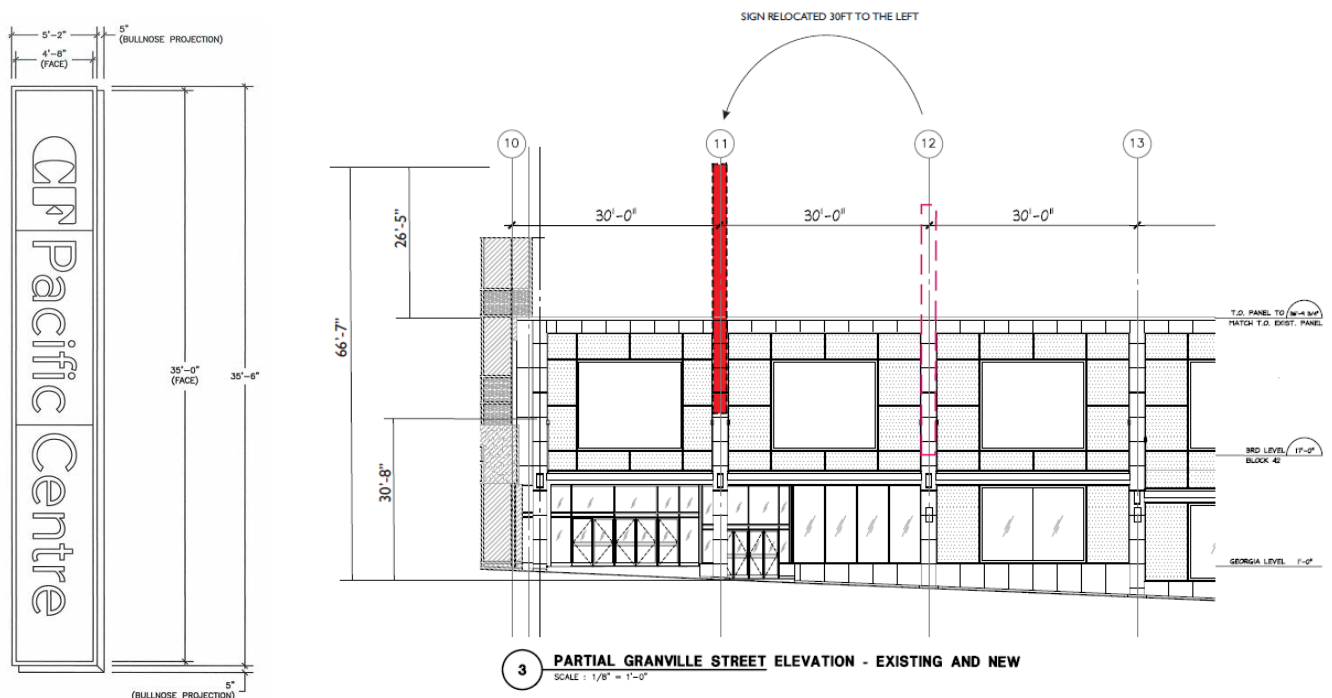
Sign permit application drawings for proposed projecting sign face, and proposed sign location shown in red.
